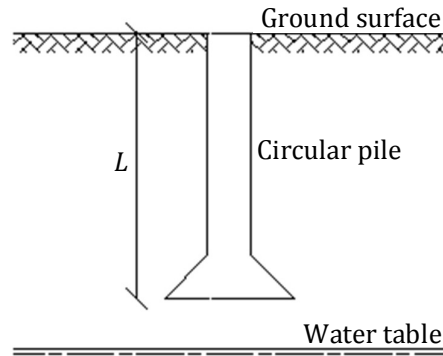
Sketching of Bhushan pier. The short pile is non-slender and has a big footing. [2] p. 69.
